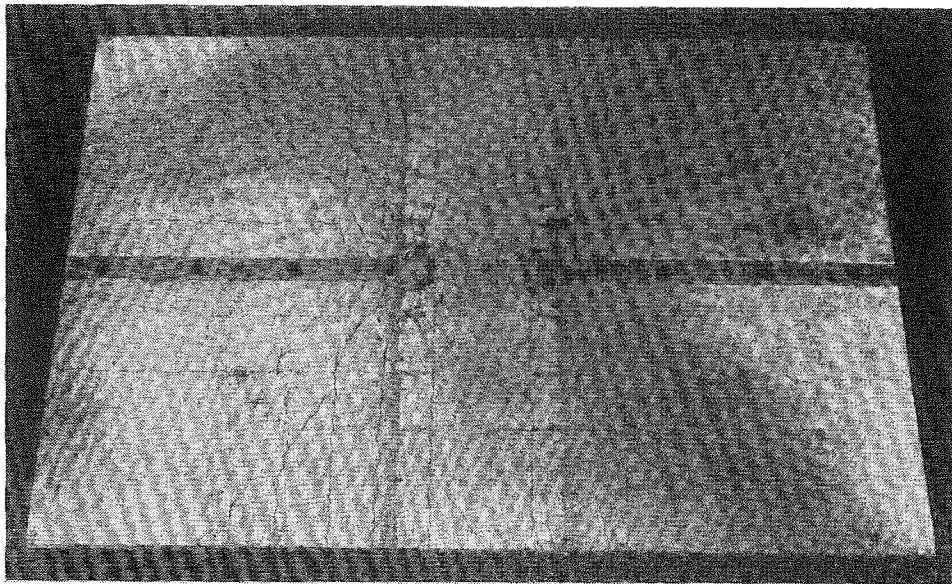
UNIT 1 AFTER DISASSEMBLY.
